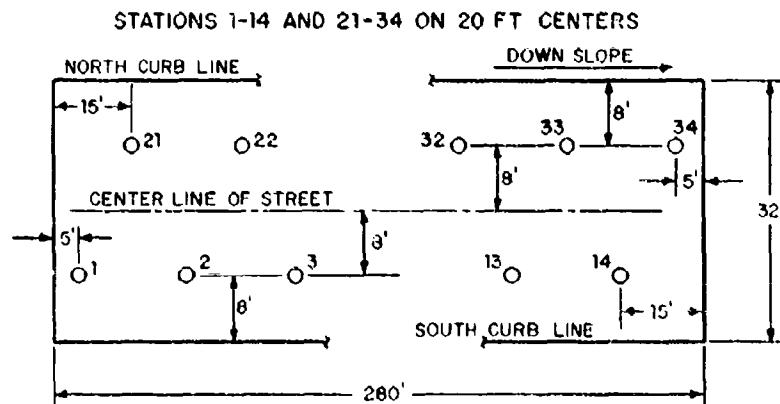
Layout of Asphalt Test Area for Full-Scale Test of Fire Nozzle, Showing Survey Stations.
